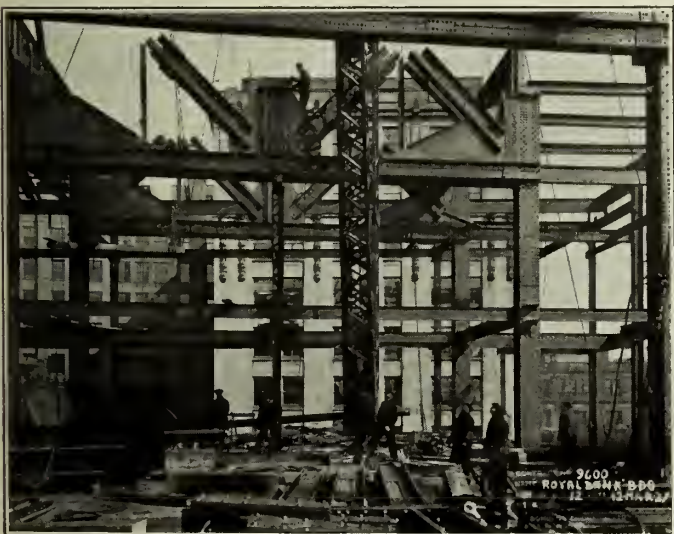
Progress of Steel Erection, March 12th, 1927.
